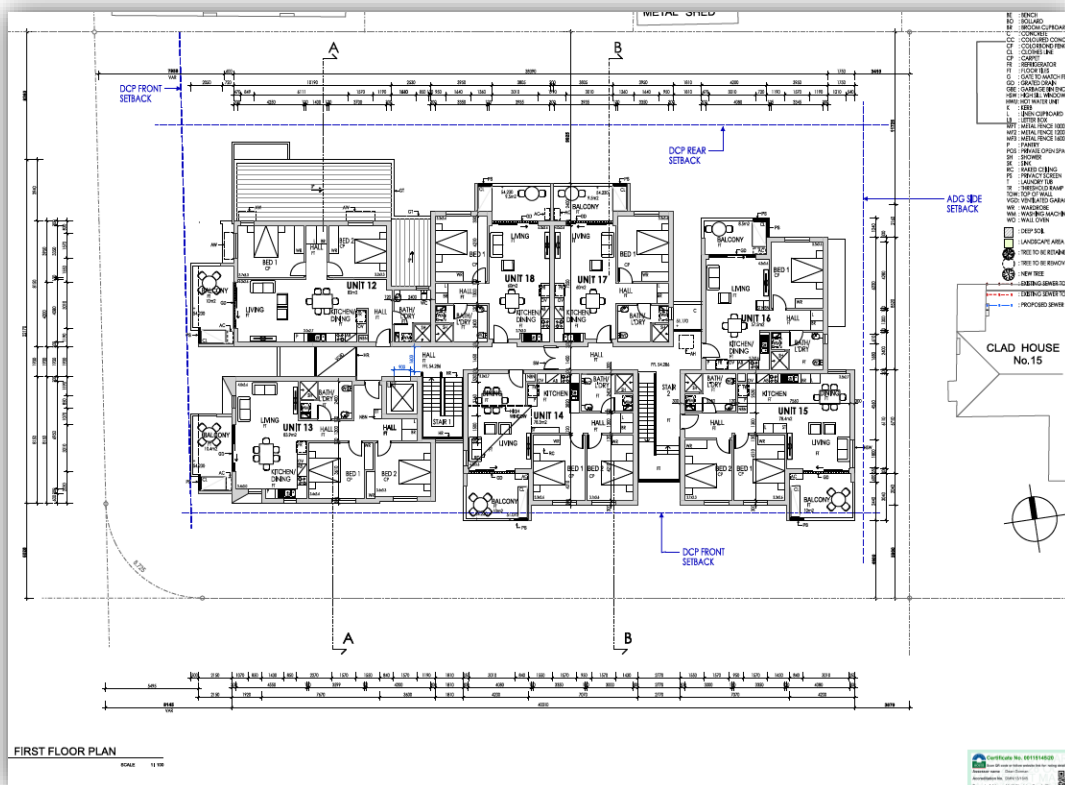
Extract from Architectural Plans – First Floor Plan (Source: DKT Architects, September 2024)
